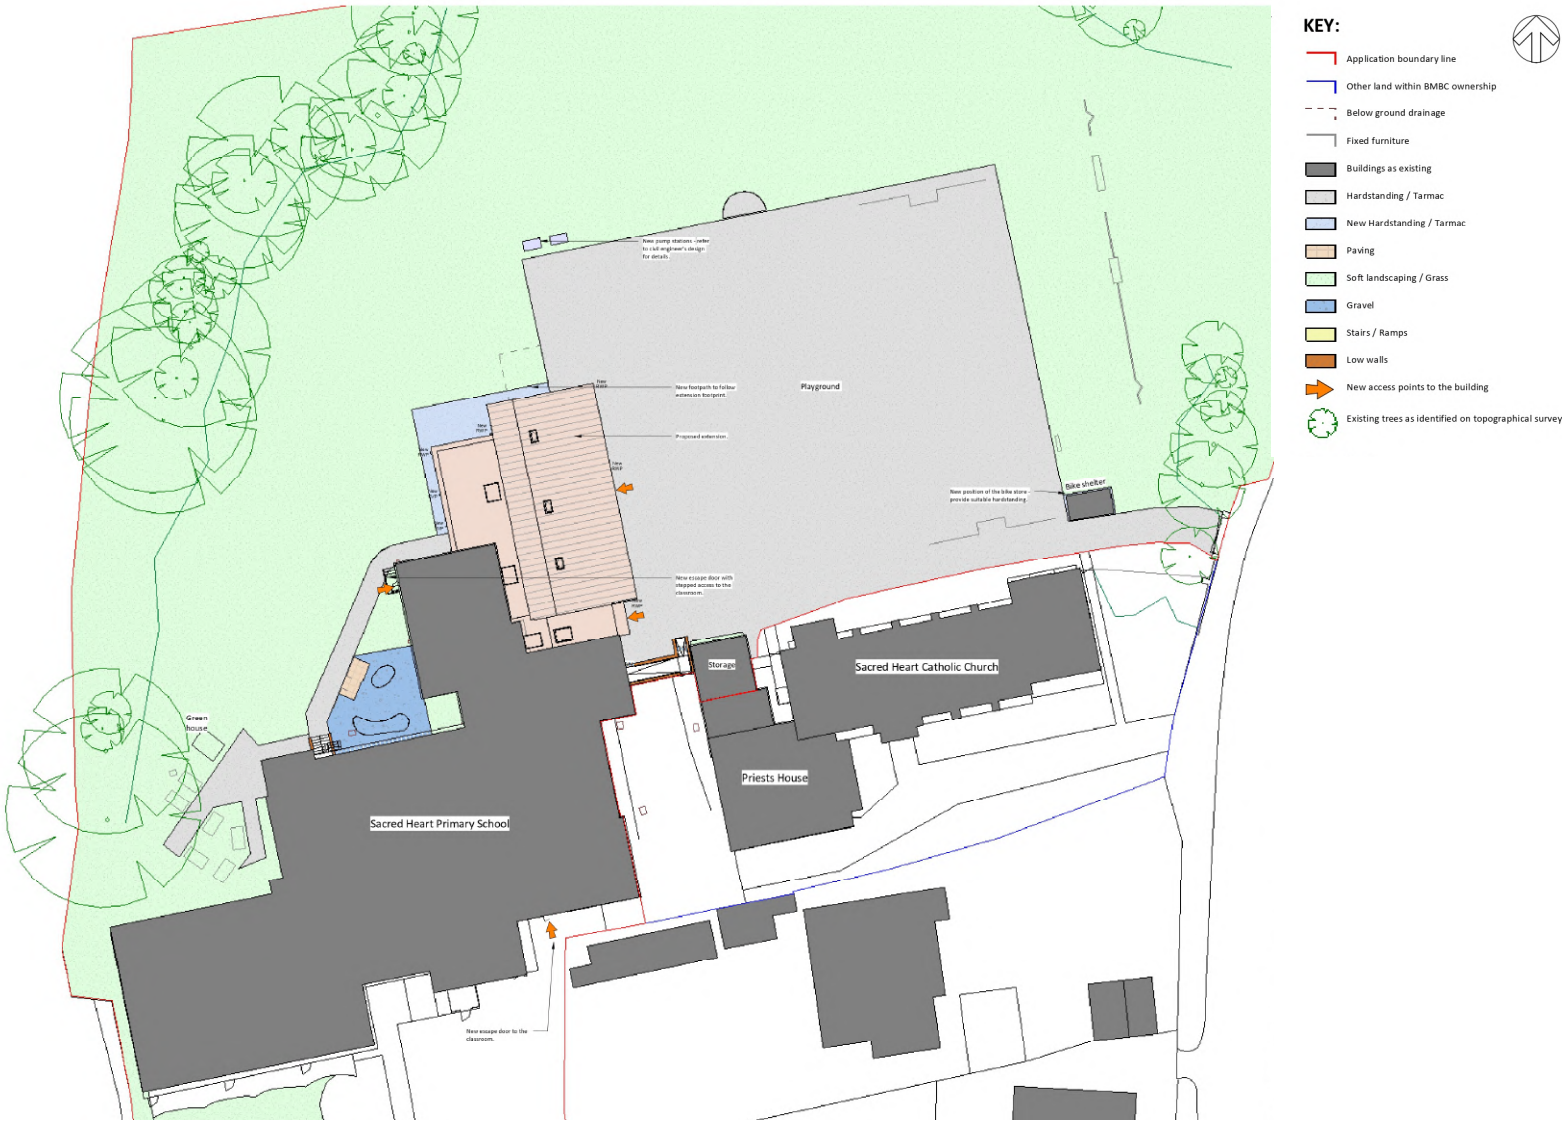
Proposed Site Plan (drawing ref no: BC2505-APS-XX-00-DR-020-P2)
